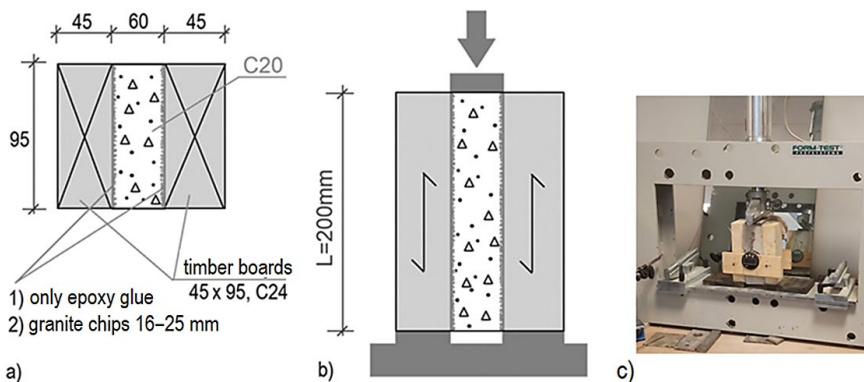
Specimens for shear test: a) top view; b) side view and loading scheme; c) specimen placement in loading equipment.
